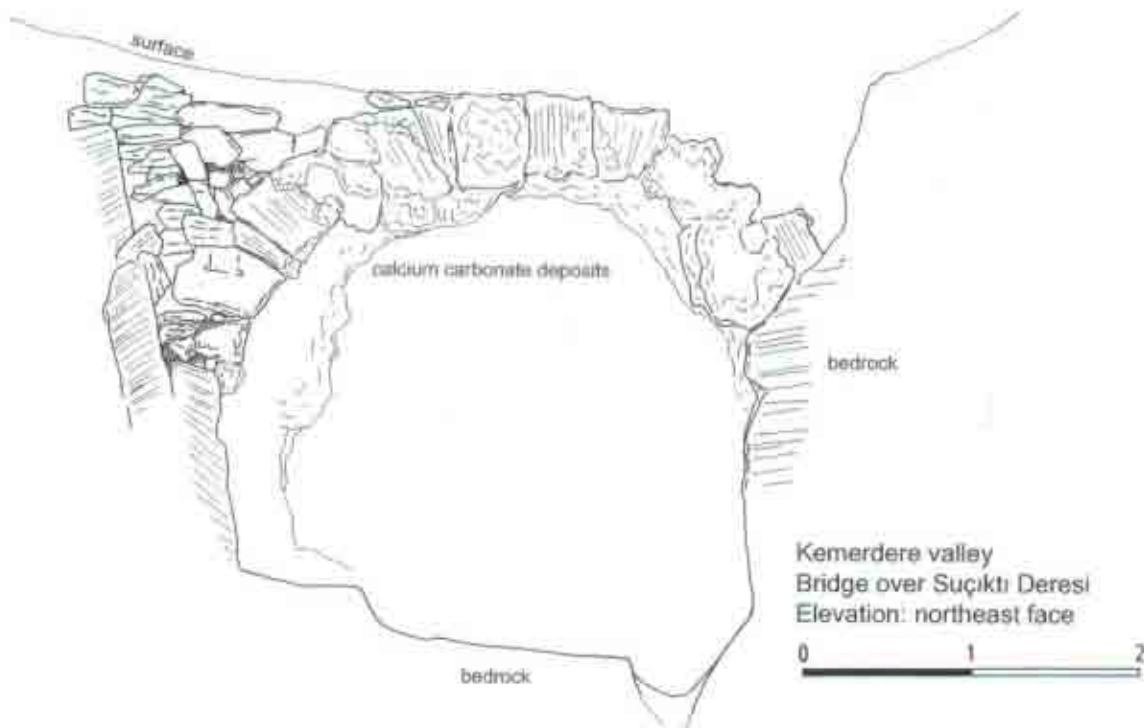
Elevation of the small bridge on the Suçıktı Deresi, northeast face. Illustration by Rüstem Aslan and Sinan Kitiç.
